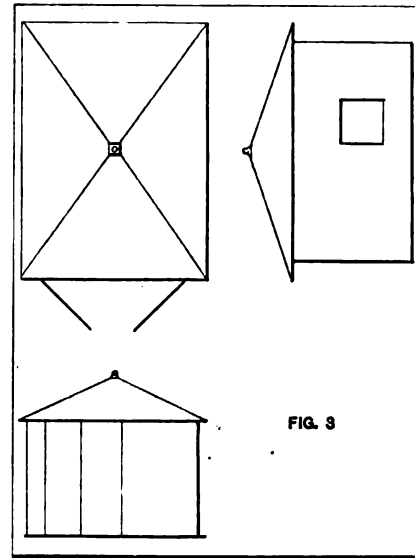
Elevation, in two planes, also looking down upon the roof of the little garage
